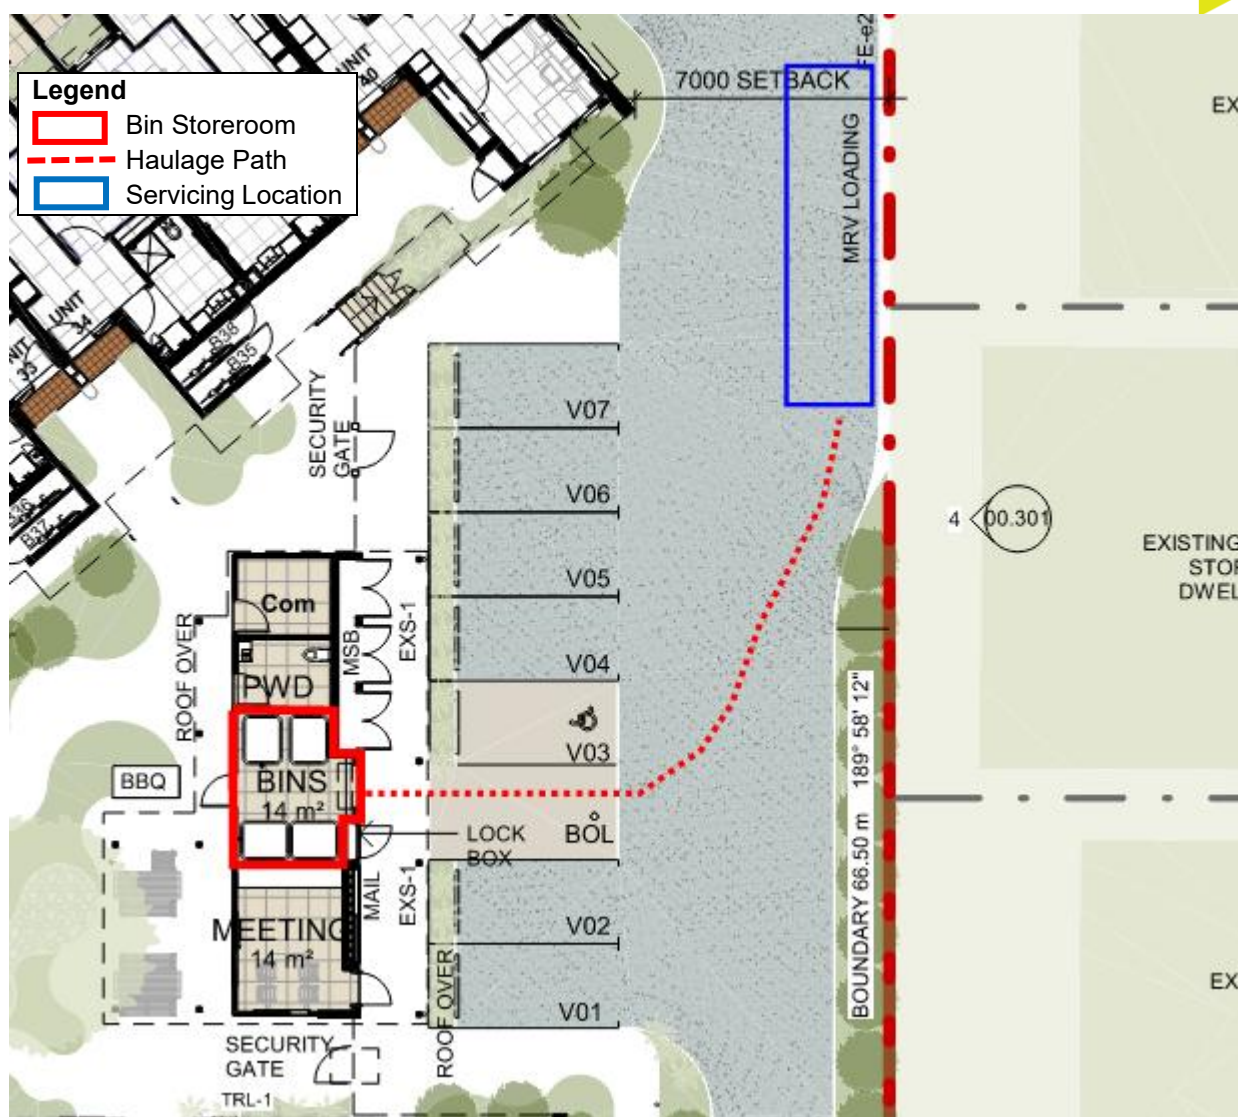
Bin Haulage Path and Servicing Location (Source: Archipelago Architects)
